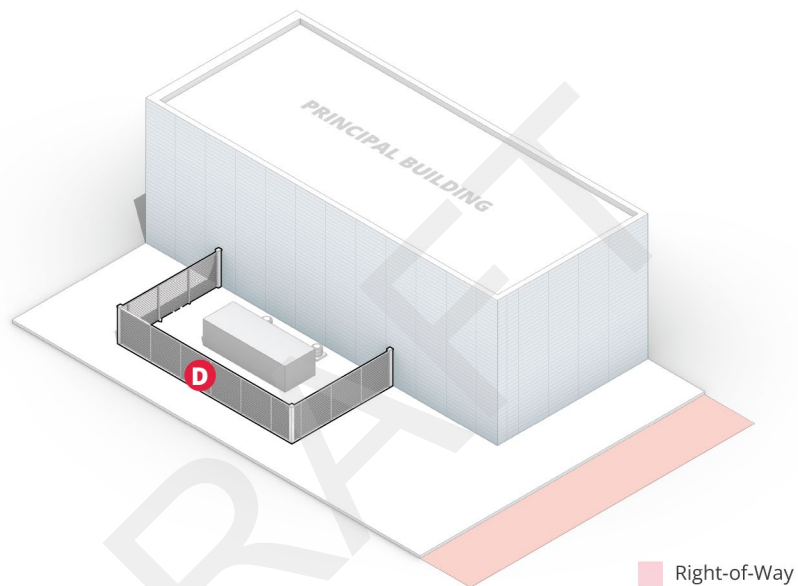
Ground- and/or Wall-Mounted Building Mechanical Equipment
